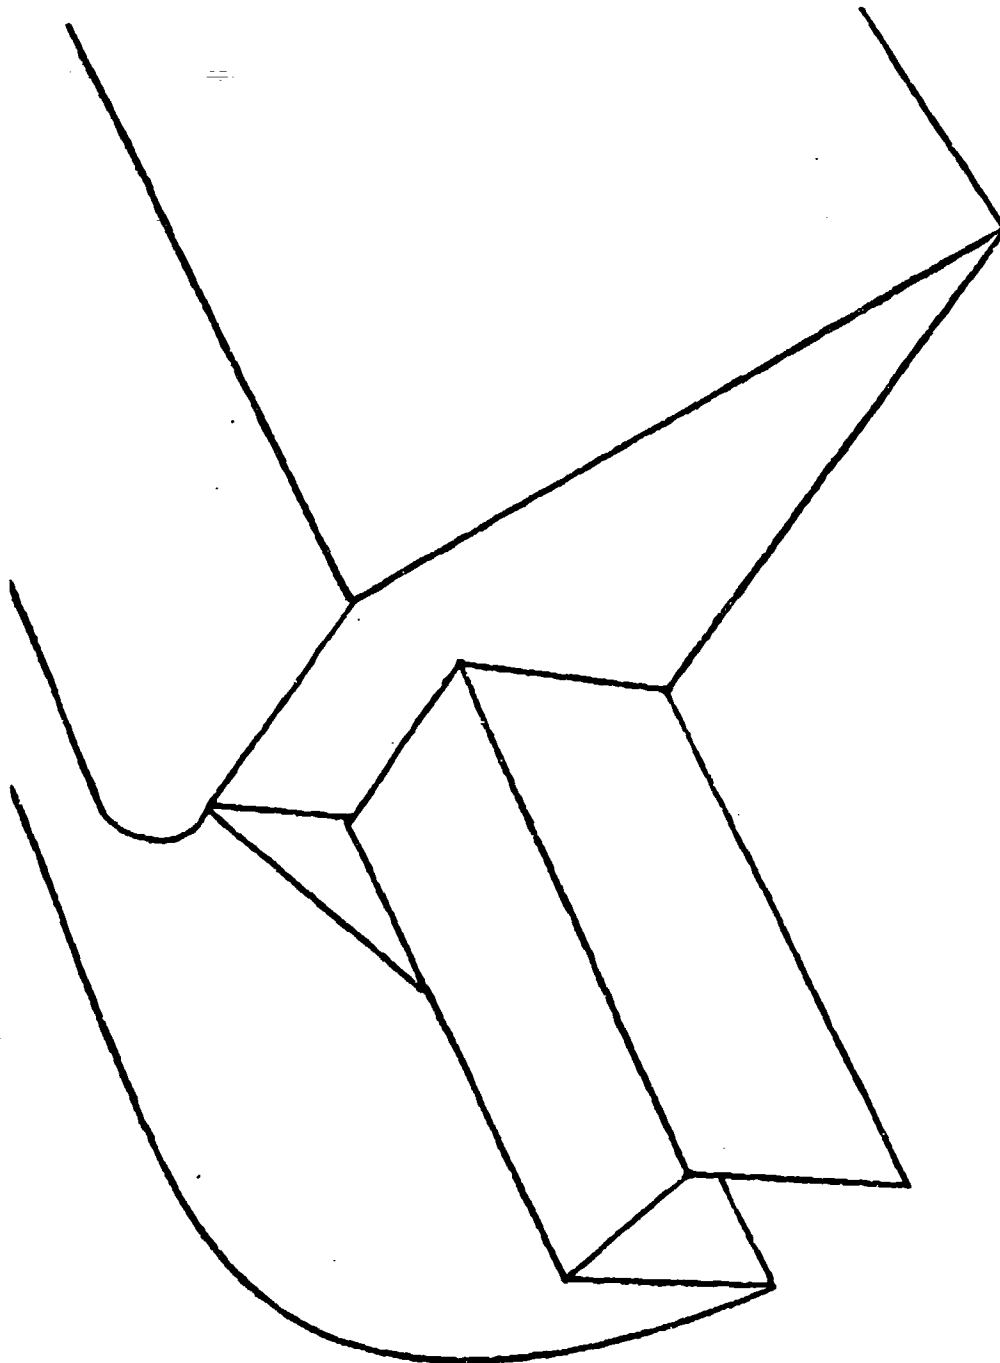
DETAIL OF VERTICAL ENTRANCEWAY
